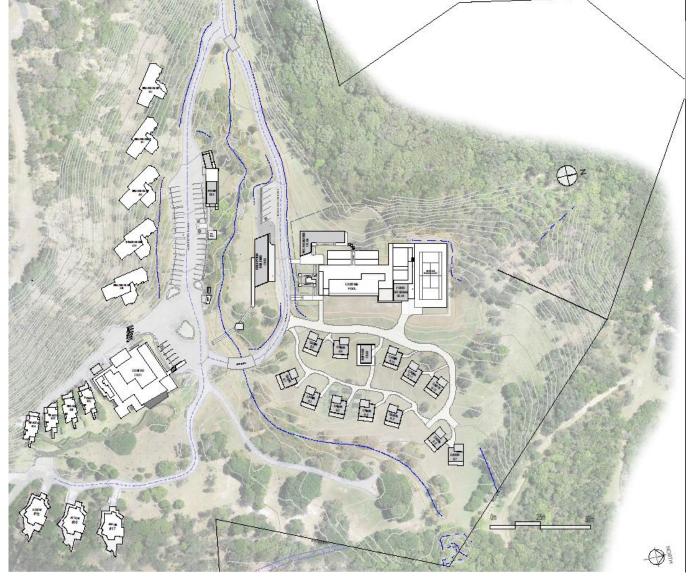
Site plan. Proposed development is shaded grey (Precinct Plan A – Satellite, Revision 15, 27/09/2022).
